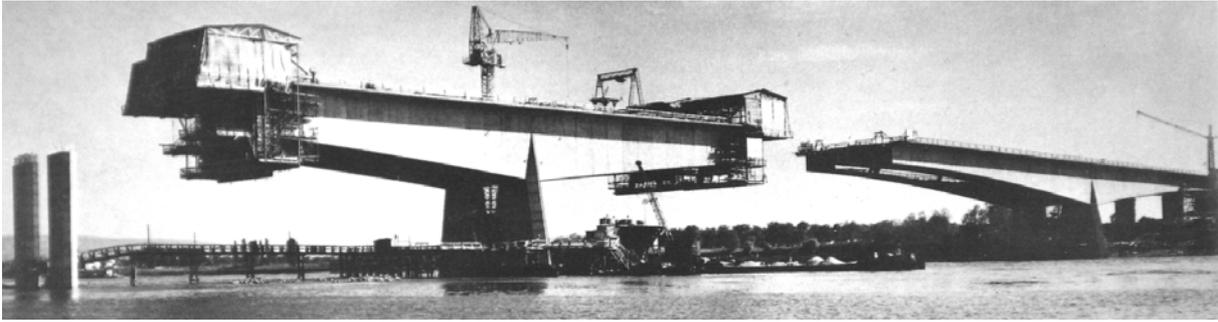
Example of form travelers used in cast-in-place, cantilever construction method. Image shows the Rhine Bridge at Bendorf, built in 1965 with a 208 m center span. A temporary access bridge can be seen that is used to transport workers to the pier from which work on the bridge is advancing. (Wittfoht)
